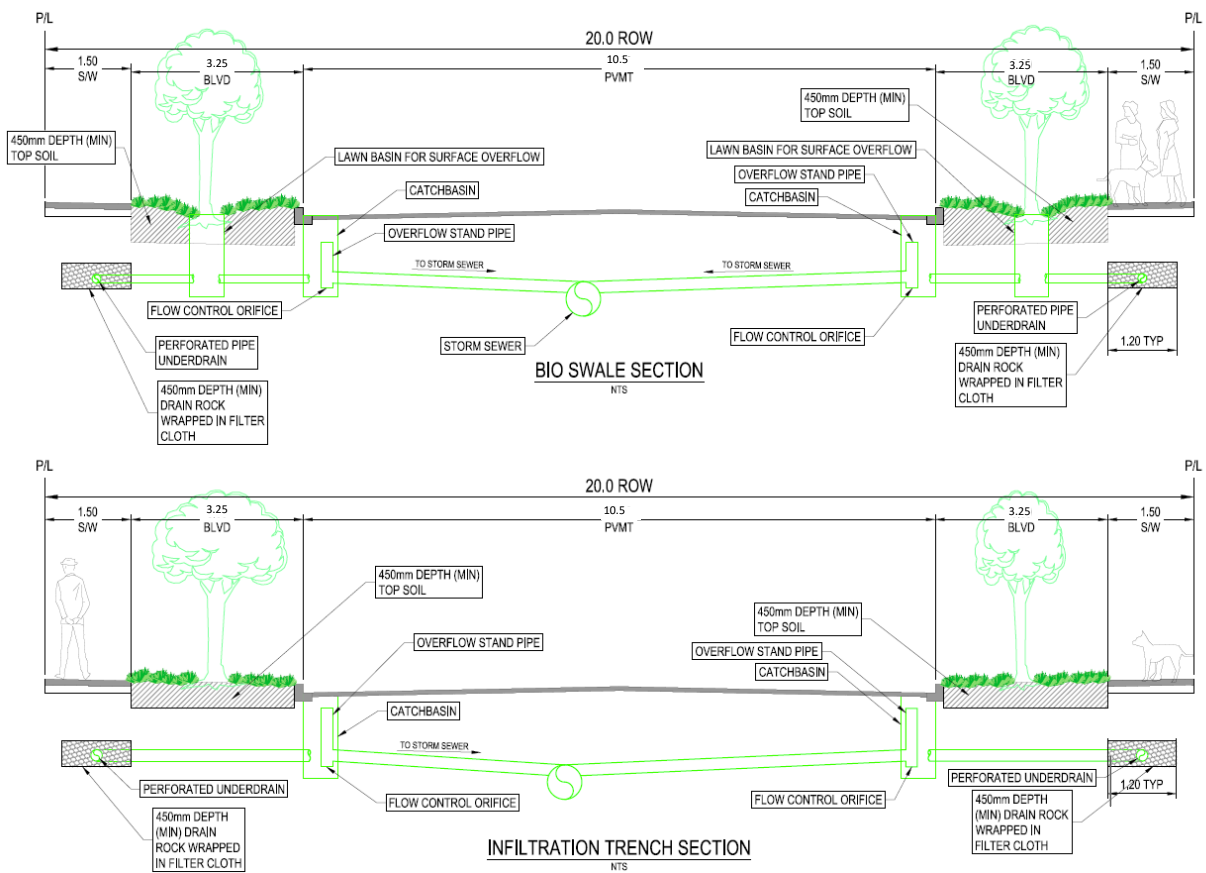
20 M Road Right-of-Way Bioswale & Infiltration Trench Cross-sections
